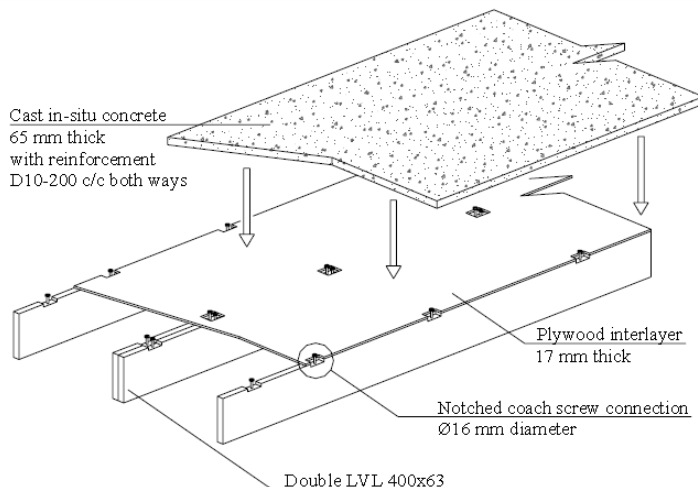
Semi-Prefabricated TCC Floor System, UC Arrangement
